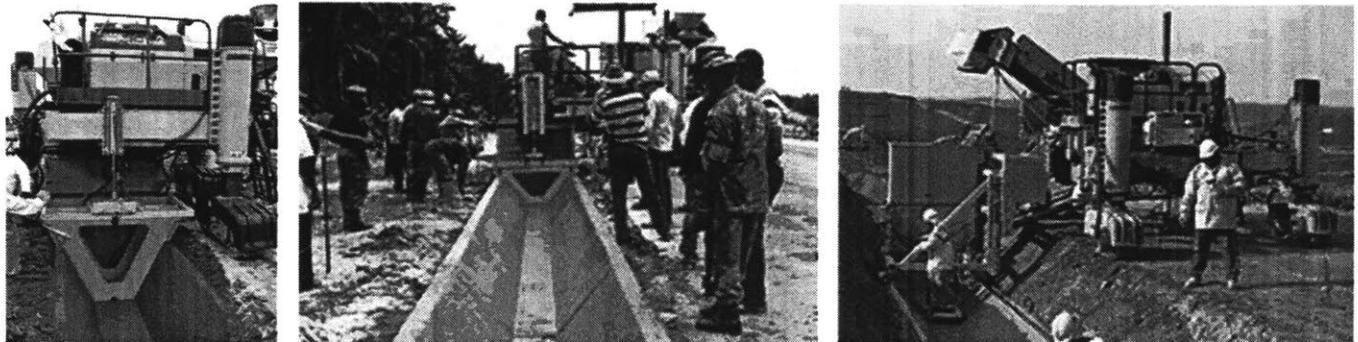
Various slip-forming molds and machines used to create road-side water drainage channels. The machines are arranged so that the forming head, and the formed features, are off-center. Such arrangements may be advantageous to cable duct bank formation abutting railroads. The machines are the GOMACO Commander III (left and right), the GT-3600 (center).
